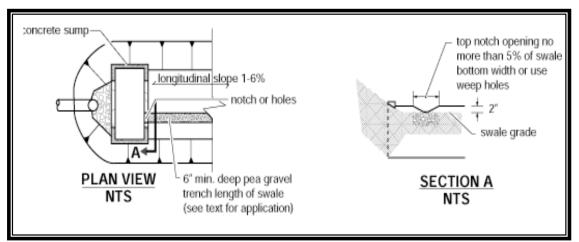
Biofiltration Swale Low-Flow Drain Detail
